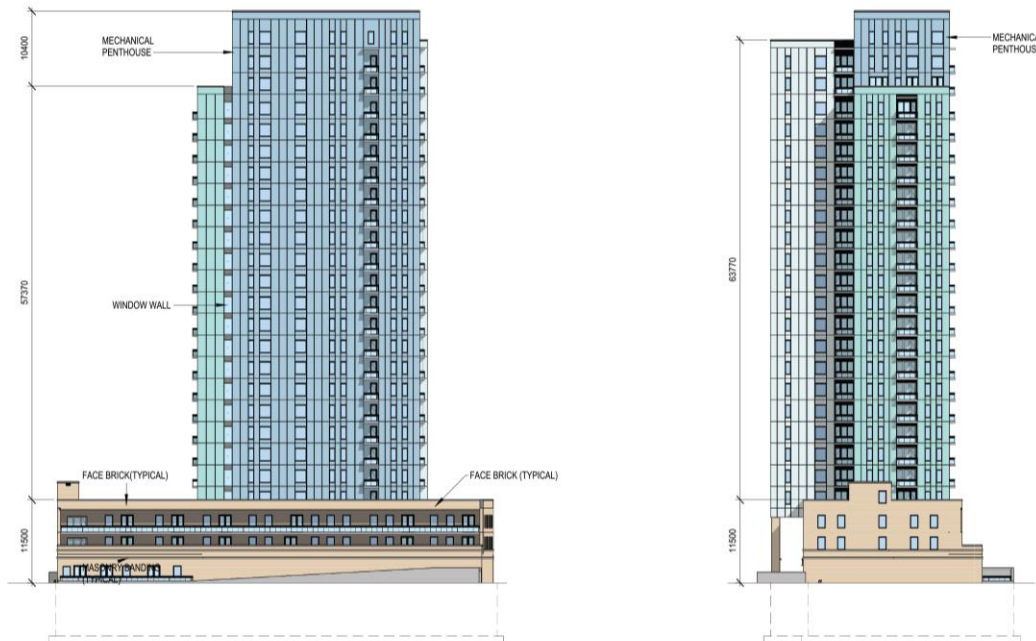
Rear (south) and interior side (west) elevation of the twenty-four-storey residential building
